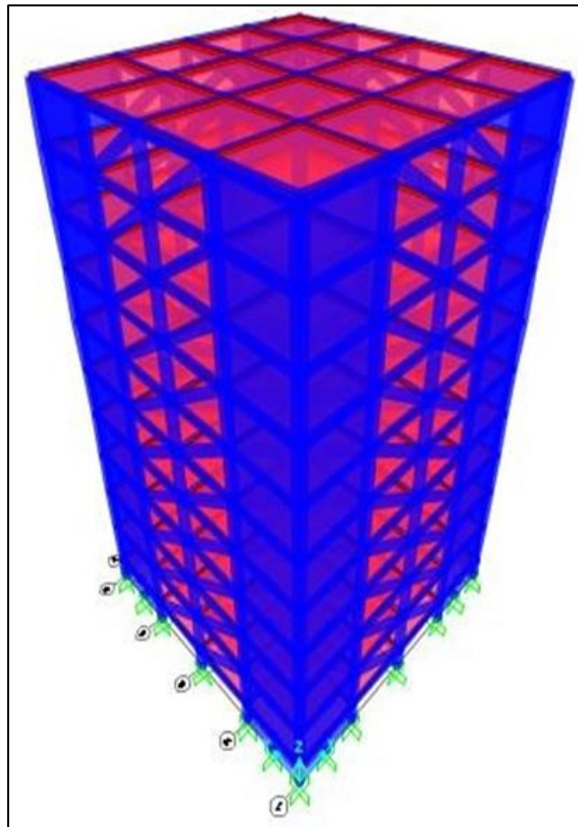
Bare Frame Model + Shear Wall + Infill Wall
